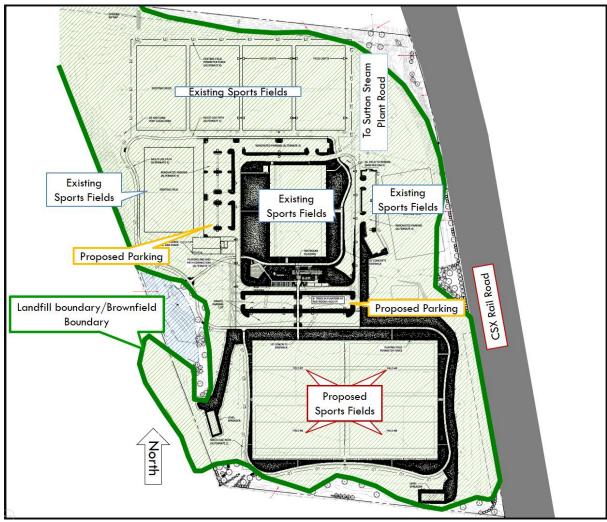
Applicant's Conceptual Plan with Staff Markups Illustrating the Landfill /Brownfield Boundary
